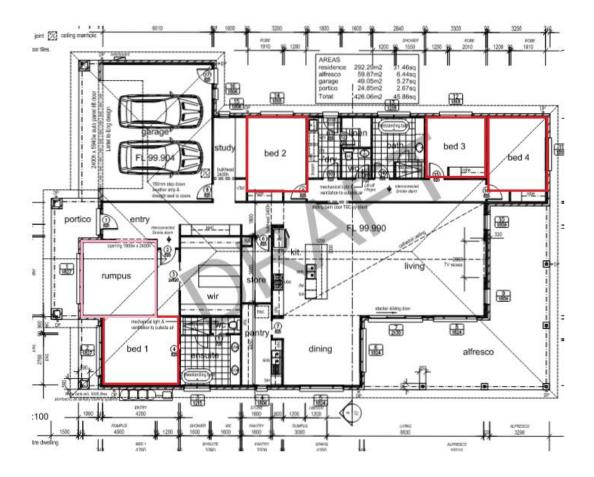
Proposed new dwelling (bedrooms in red, proxy rumpus in pink) Net5br)
